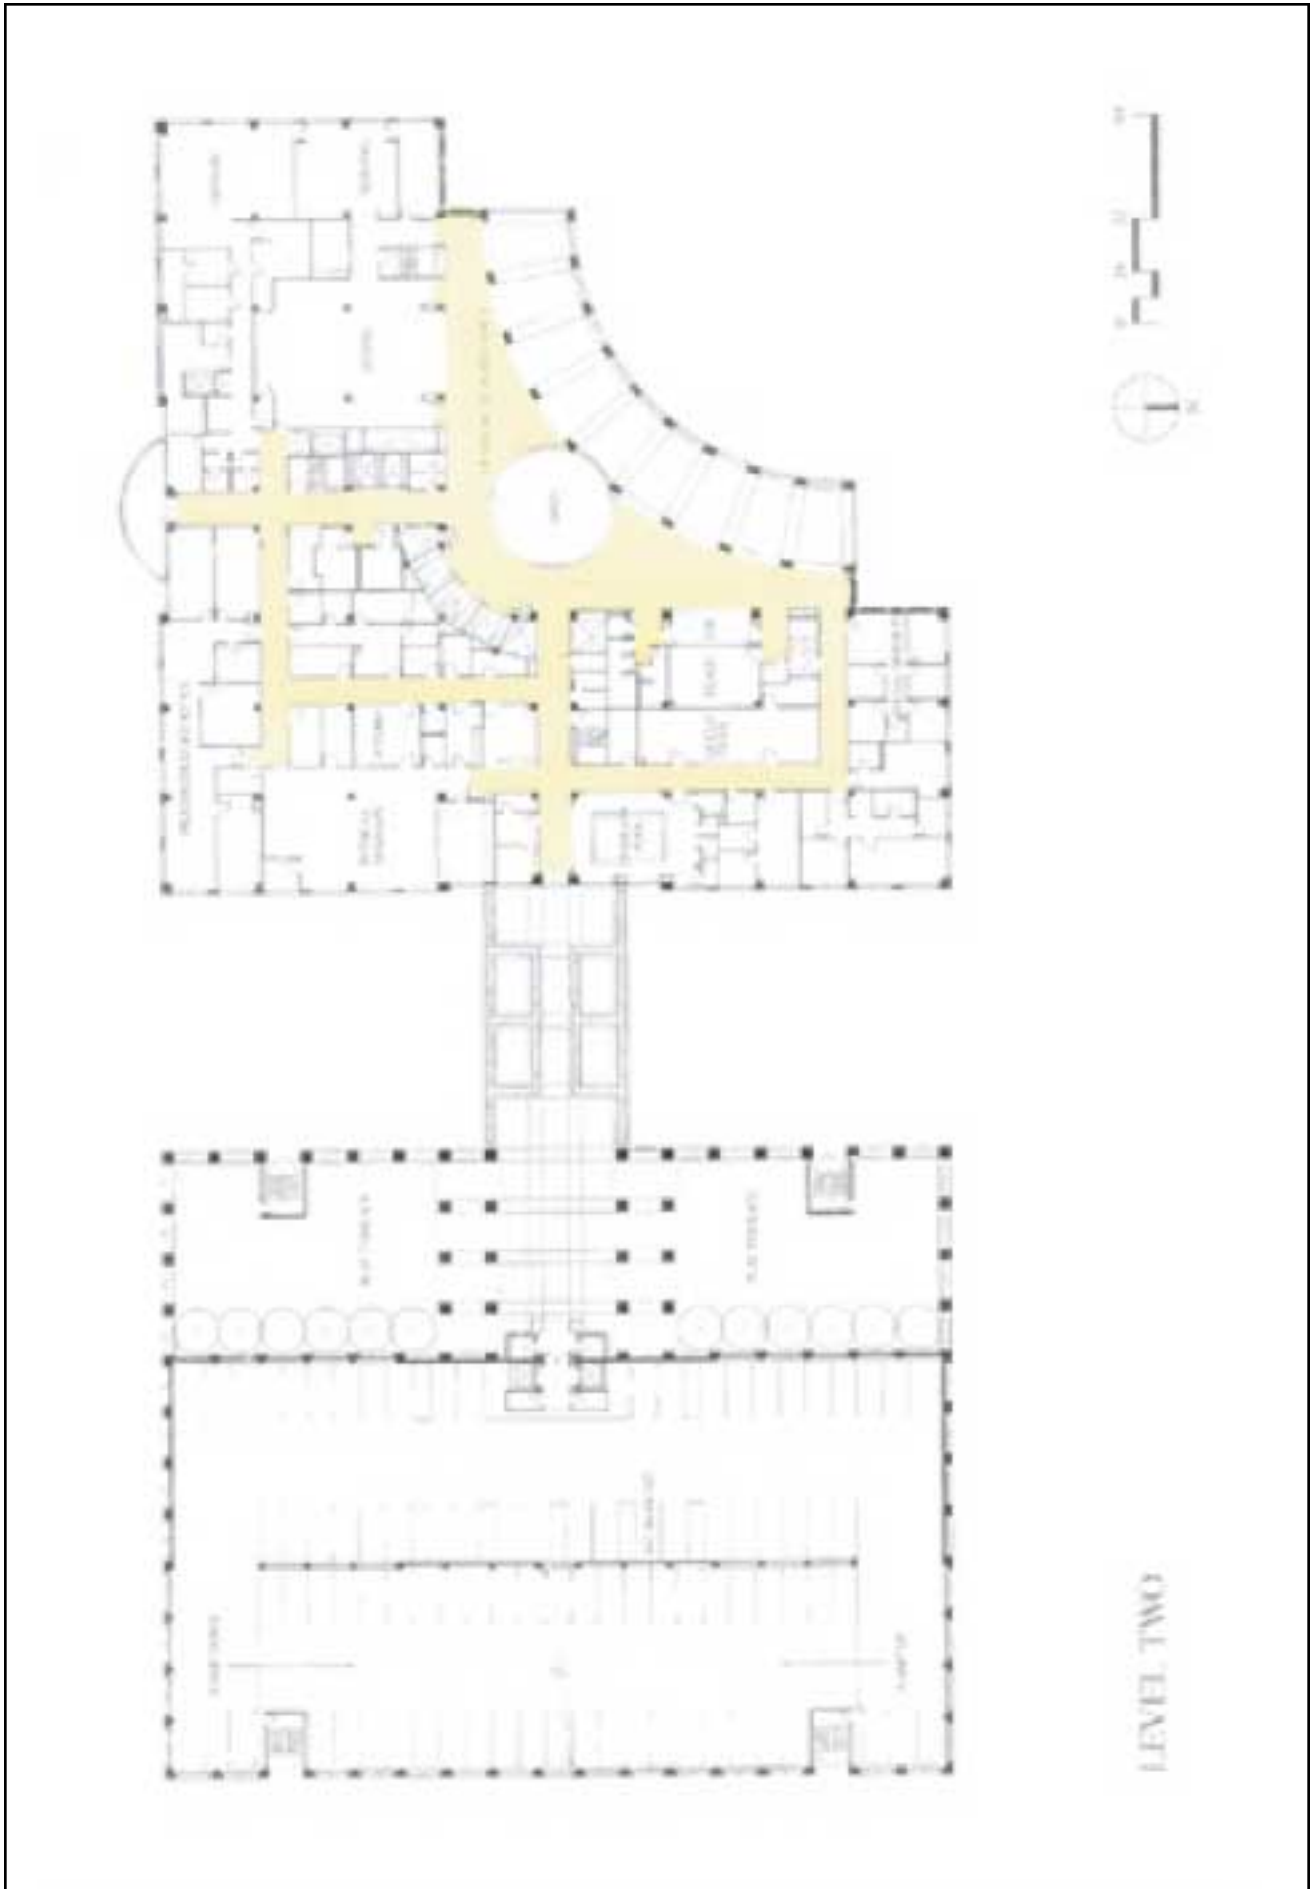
Floor plan of Level 2 of hospital and parking structure.
